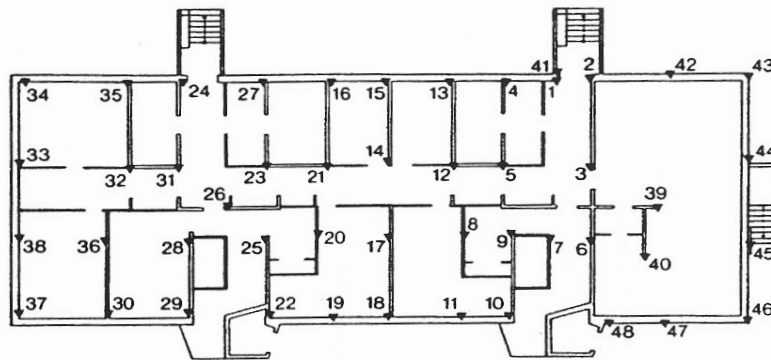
Locations of Piles for the Building, Uppsala (Jendeby, 1986).
